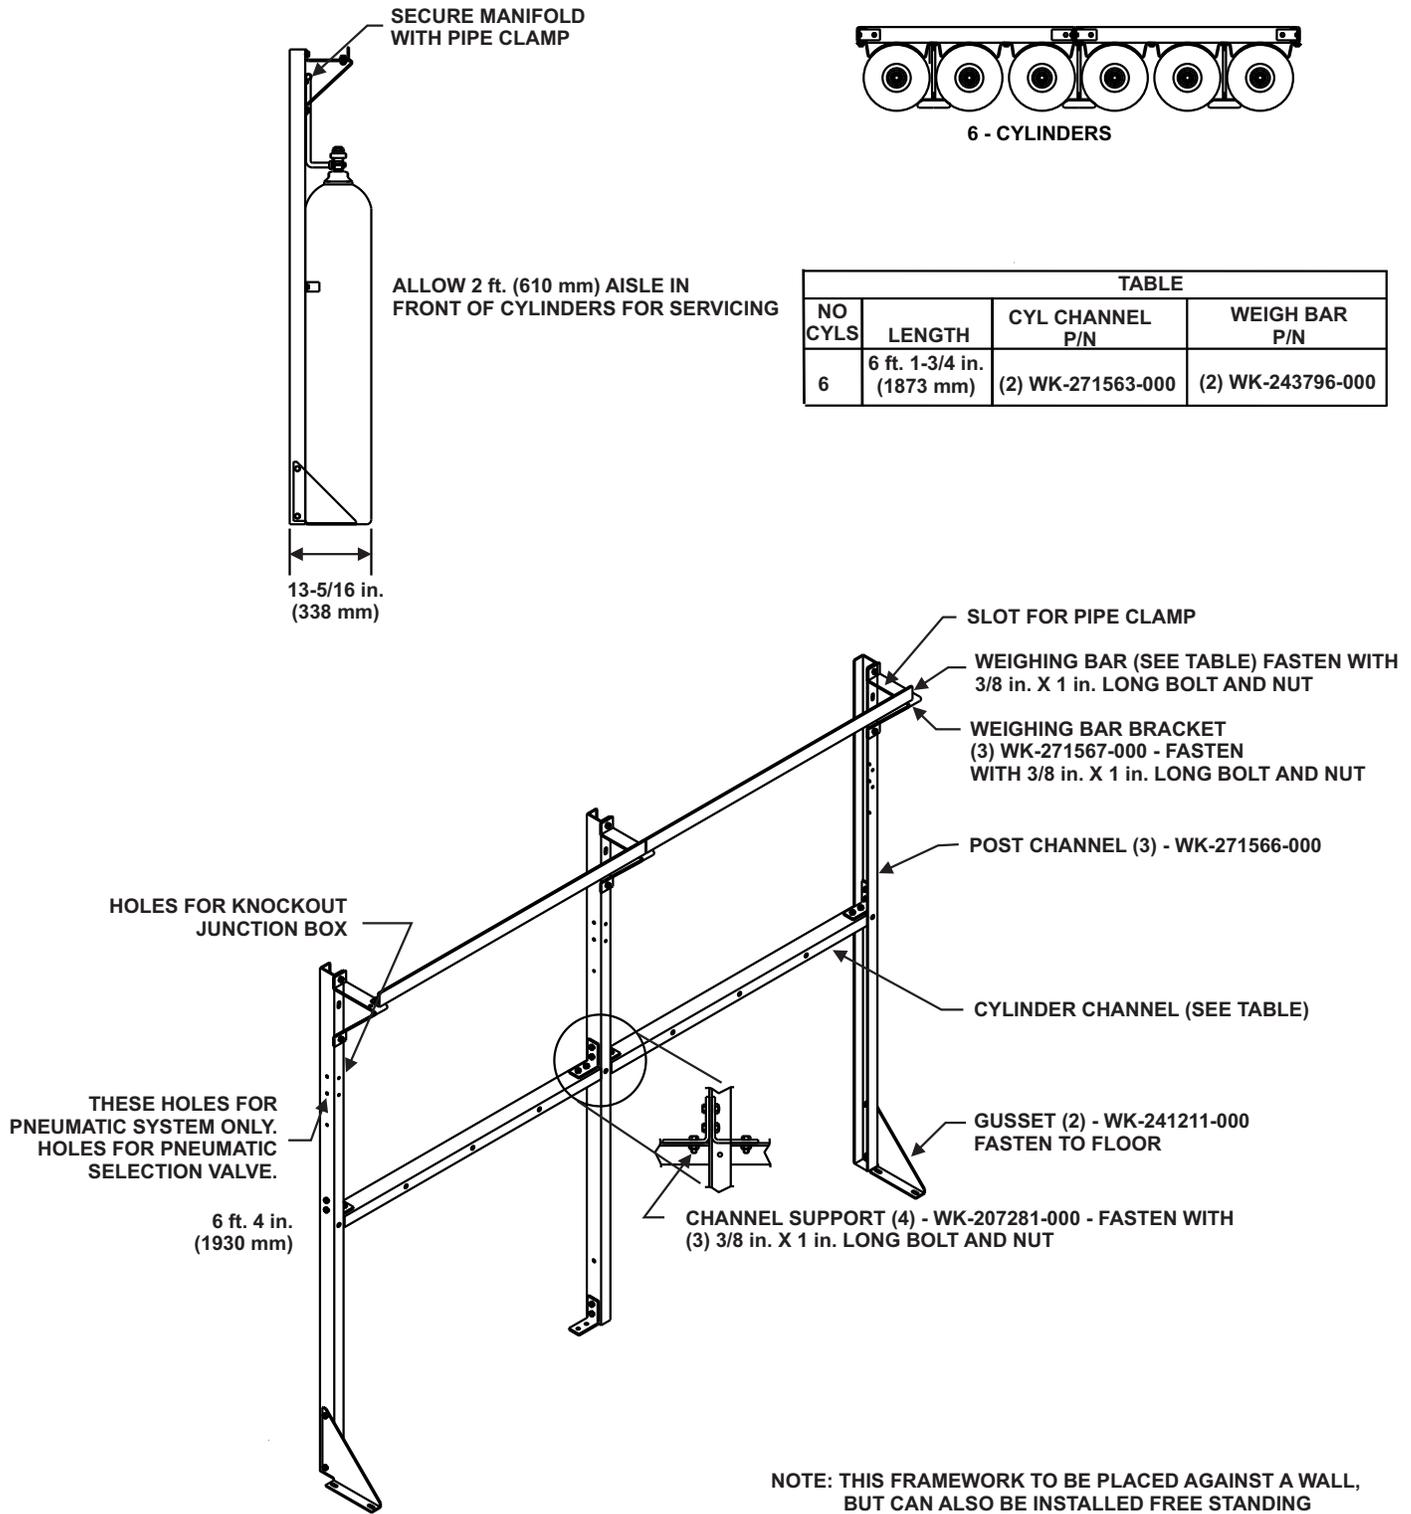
Cylinder Rack and Framing, Example Arrangement
